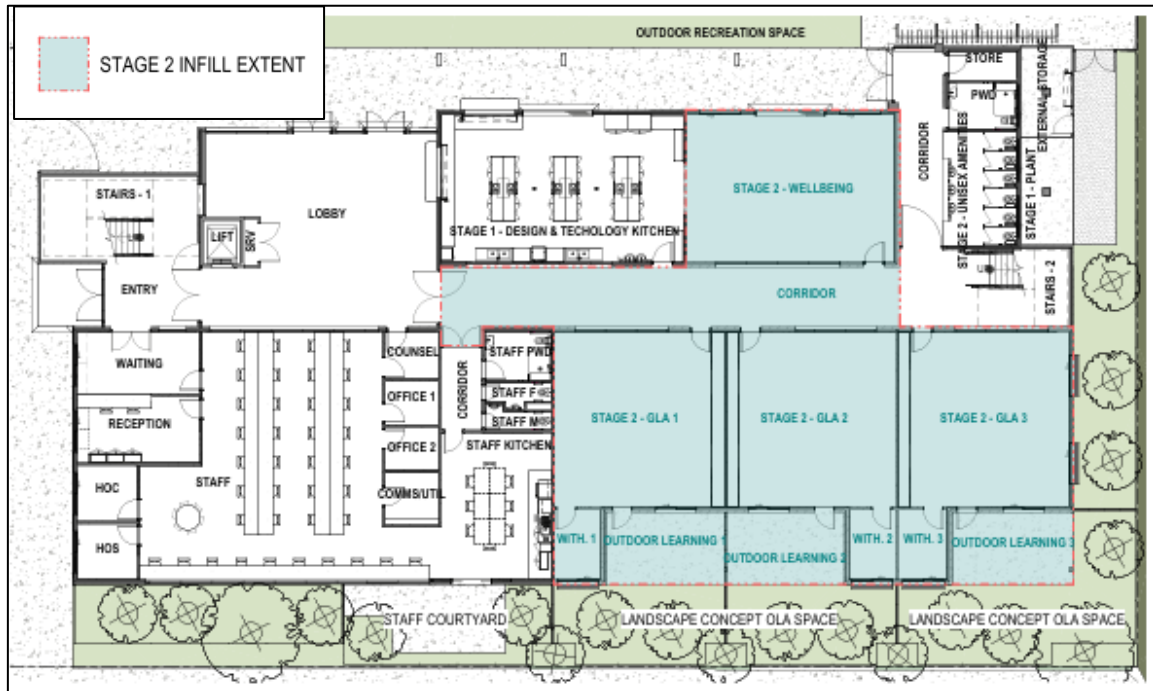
Ground level plan showing extent of the building to be delivered in Stage 2
